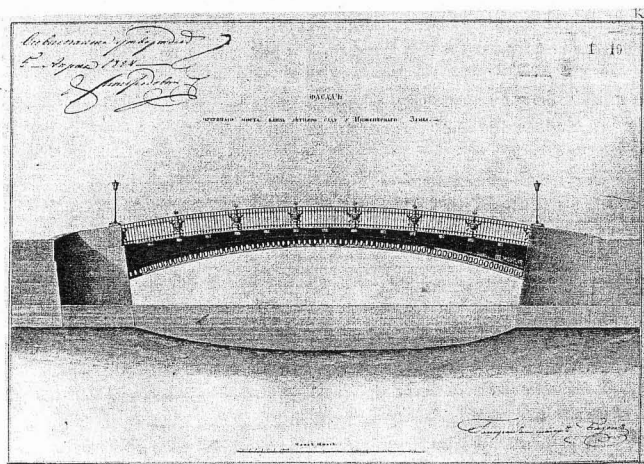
P.-D. Bazaine, drawing from a cast iron bridge over the Moyka River in St. Petersburg, 1824. The bridge was built in 1825.
